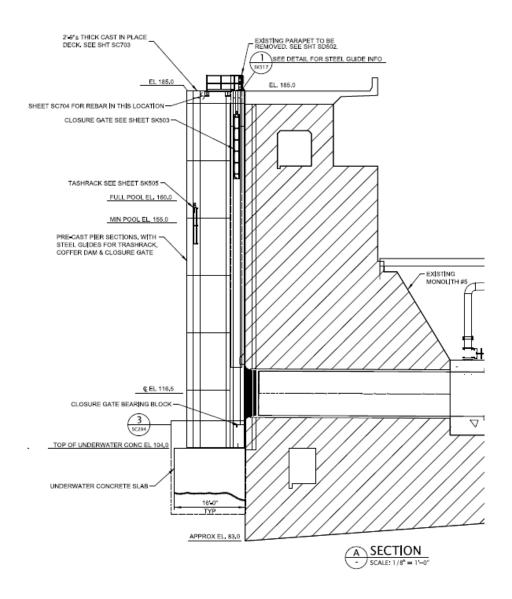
The Dalles AWS Backup System Trashrack, Section
